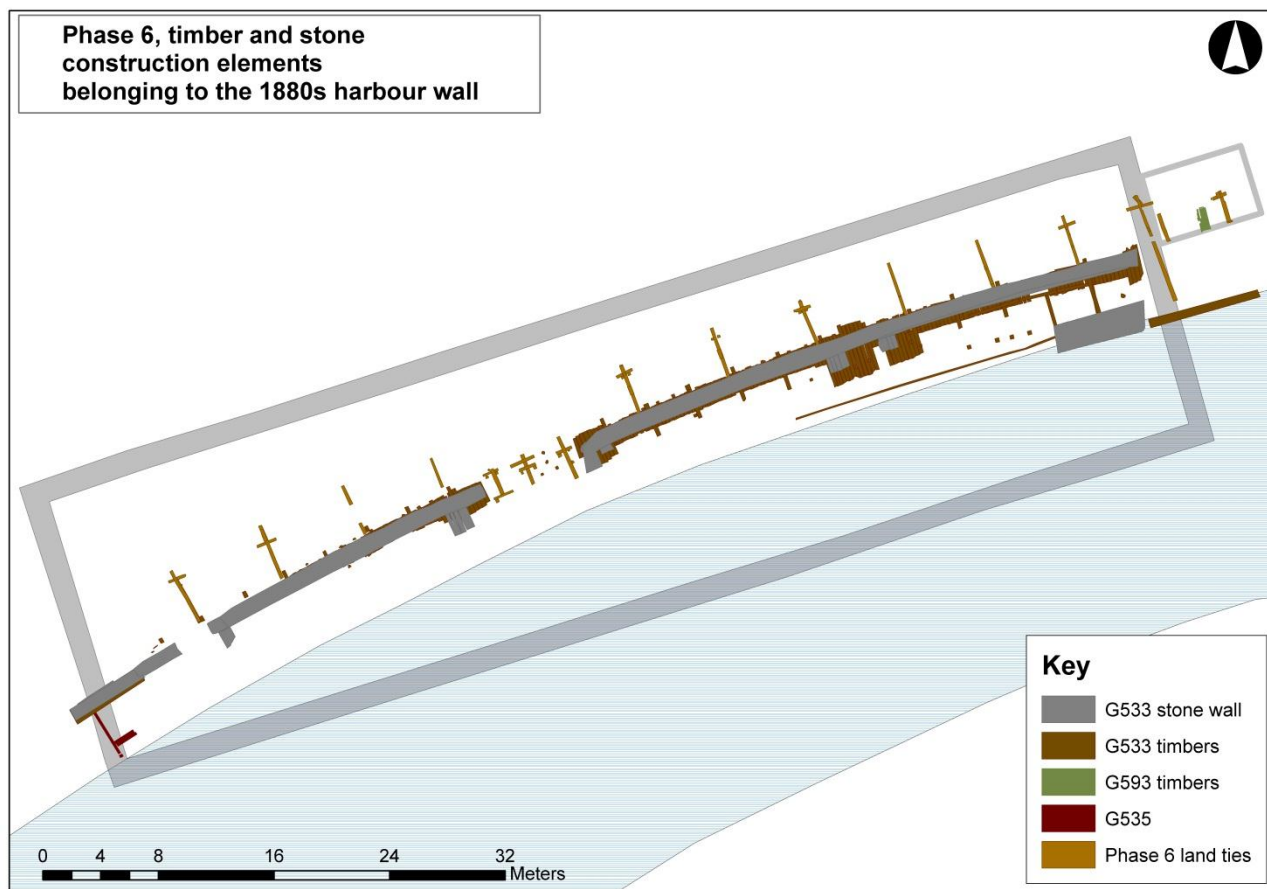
Plan of 1880s harbour wall showing the timber and stone construction elements
